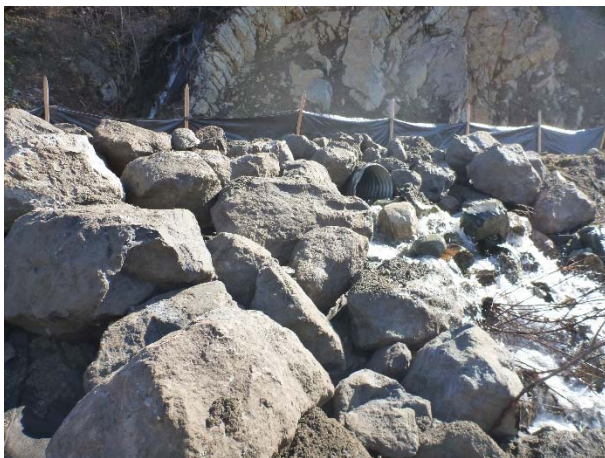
Armouring of culvert outlet on ASTR-03 (April 7, 2016).
